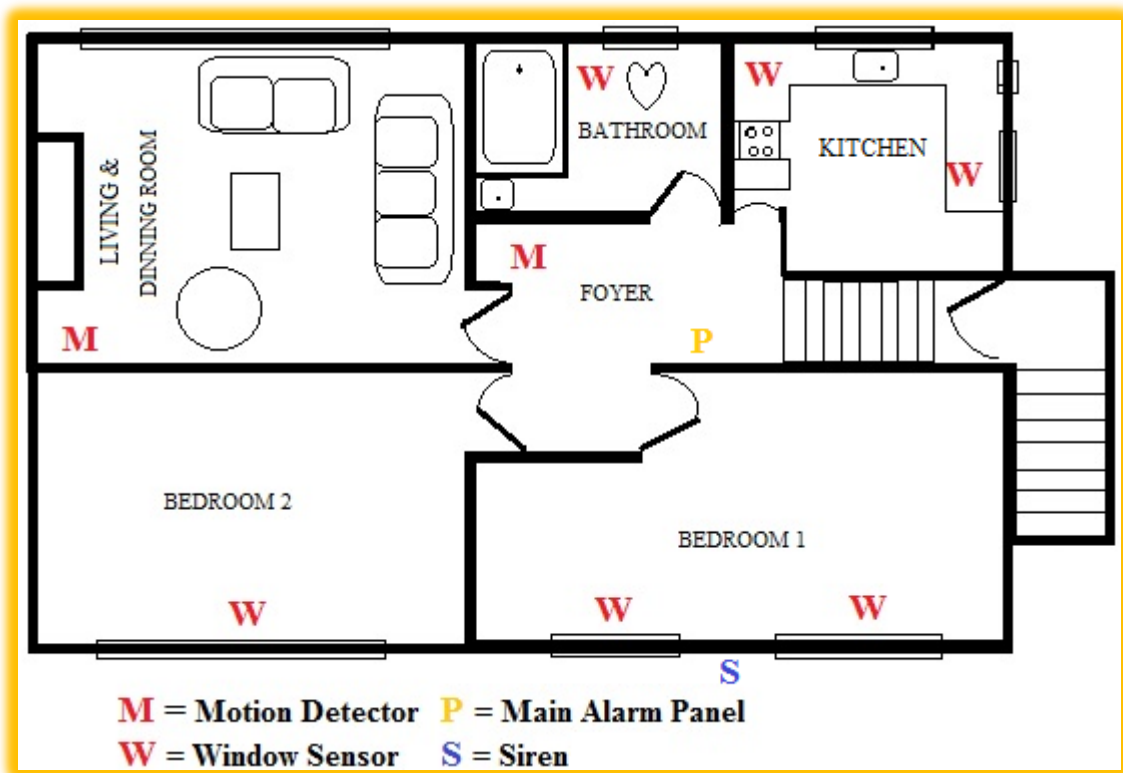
HOUSE PLAN AND SHOWING DETECTORS
